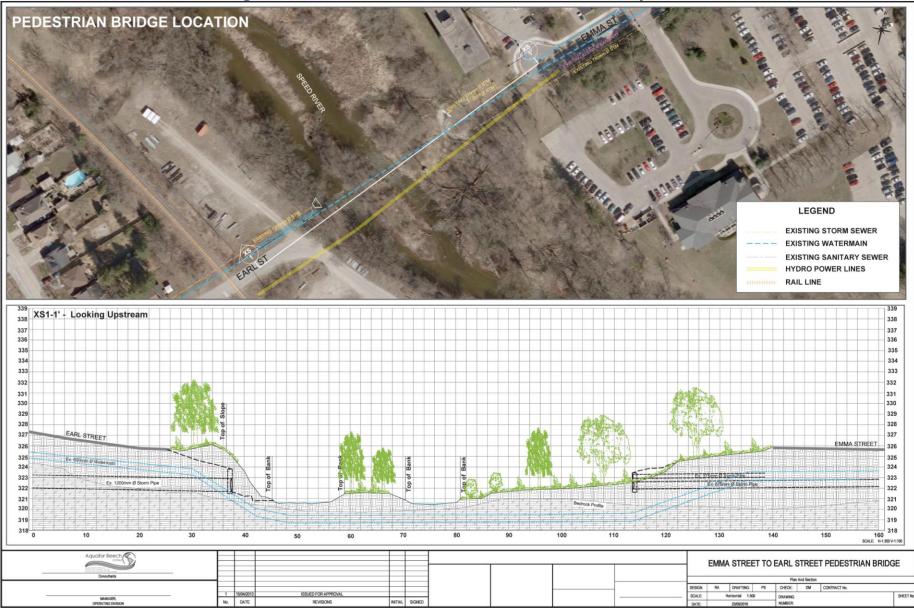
Plan & Cross Section of Emma to Earl Study Area.
